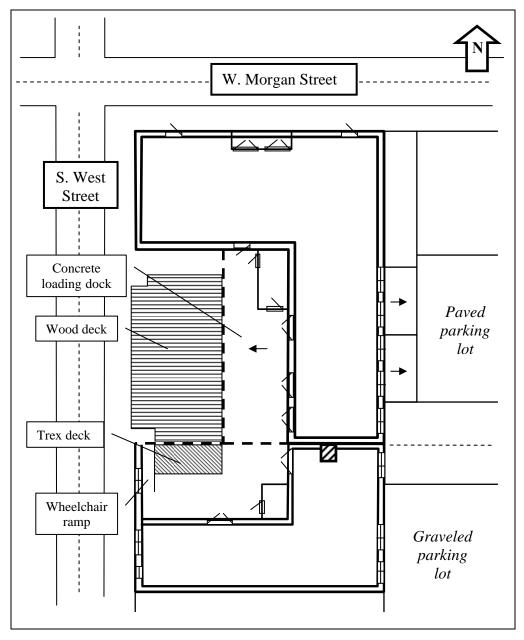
Site Plan, 411 W. Morgan Street. Not to scale.
